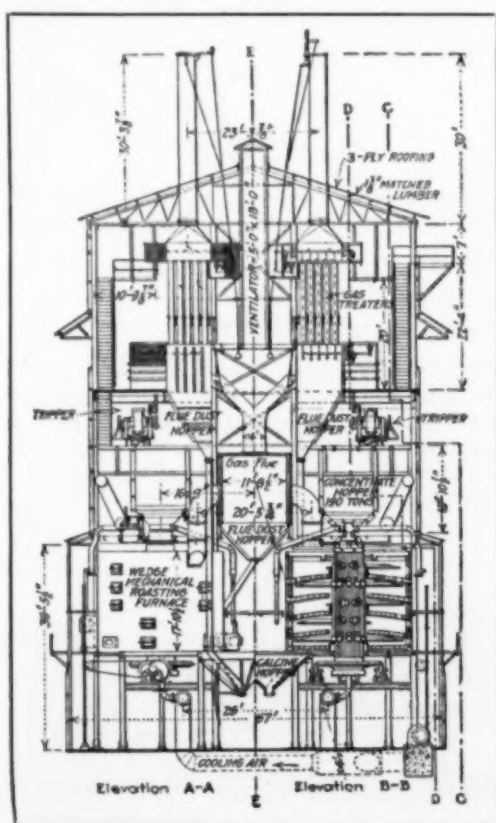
END ELEVATION OF ROASTER AND DRYER PLANT, INTERNATIONAL SMELTING CO.
